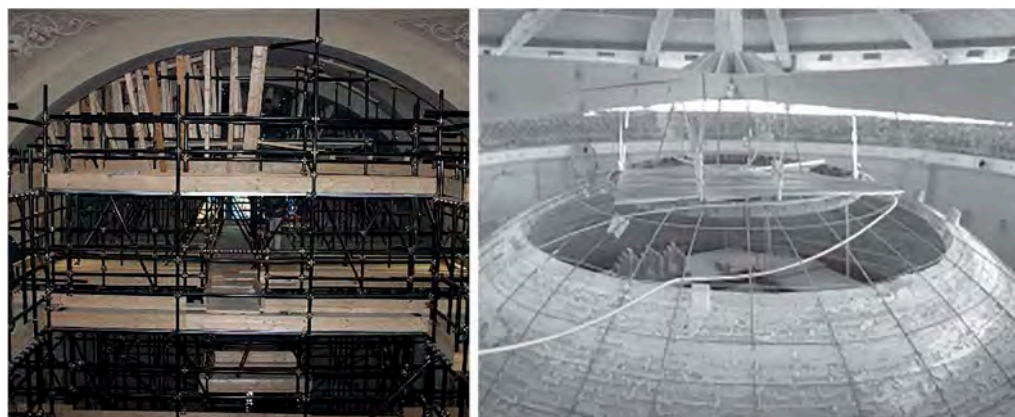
On the left, Santa Maria Assunta Church in Reggiolo (RE): the structural scaffolding, which first aim was the shoring of damaged vaults, allowed to deepen the knowledge of the damaged building and to carry out the final restoration works. On the right, Collegiata di Santa Maria Maggiore in Pieve di Cento (BO): the emergency hooping system of the damaged drum became a definitive element of strengthening whereas the shoring system with the scaffolding supported the reconstruction of the partially collapsed dome.
